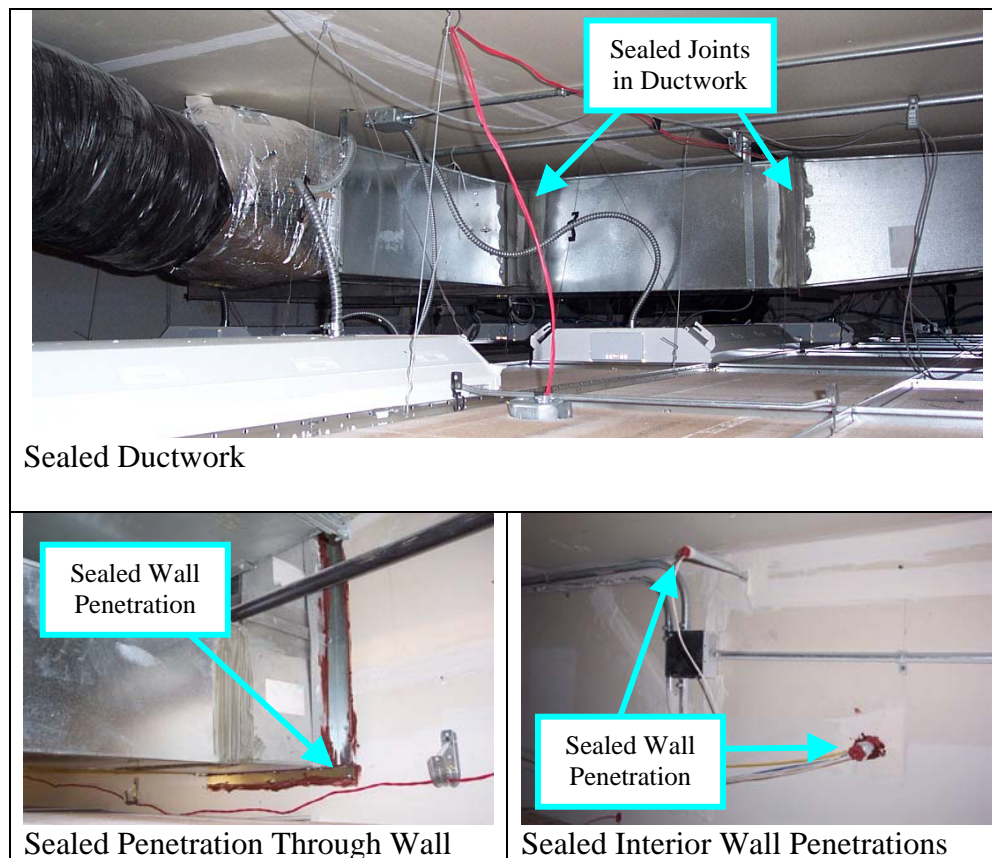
Sealed Ductwork Connections and Sealed Penetrations through Interior Walls
